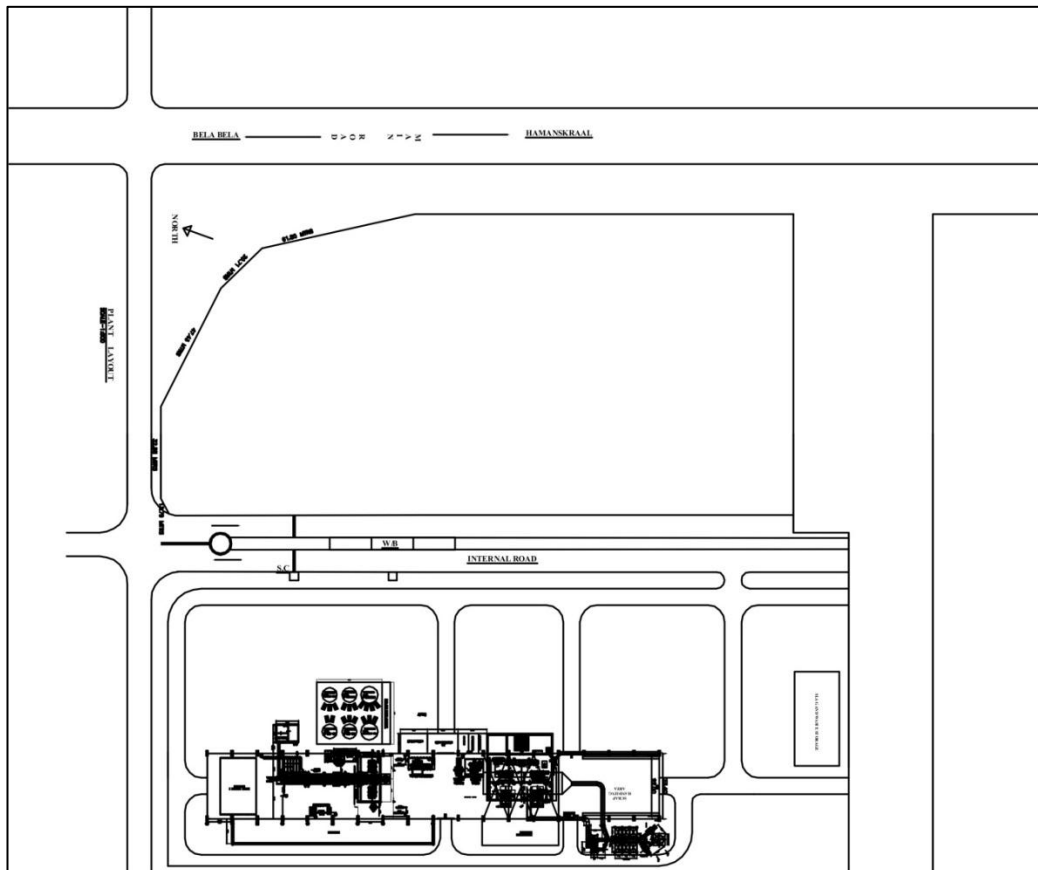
Plan of infrastructure planned for the Babelegi steel recycling facility.
